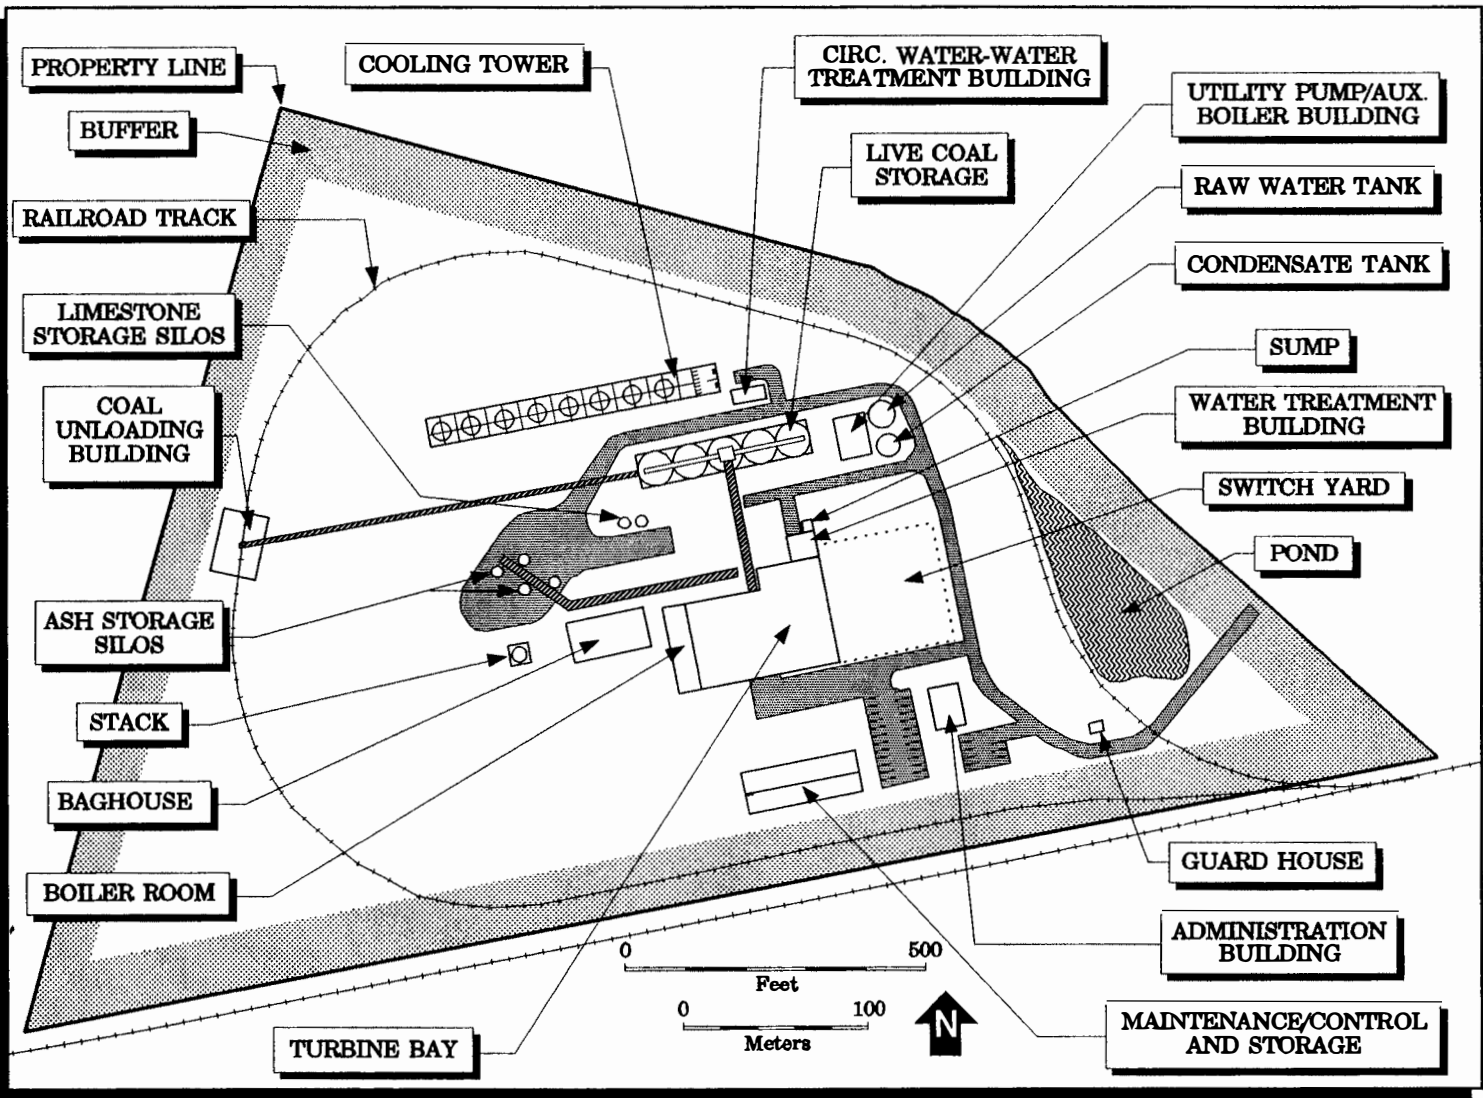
Proposed YCEP Cogeneration Facility site plan for the alternative West Manchester Township site.
